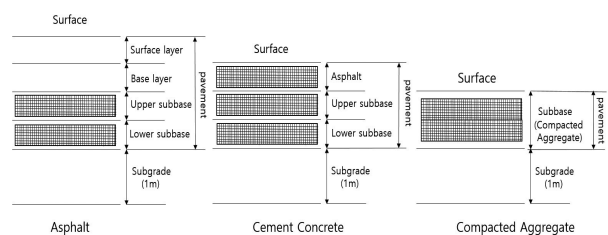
Example of Pavement Sections by Pavement Type (Agriculture, forestry and fisheries, 2004)
